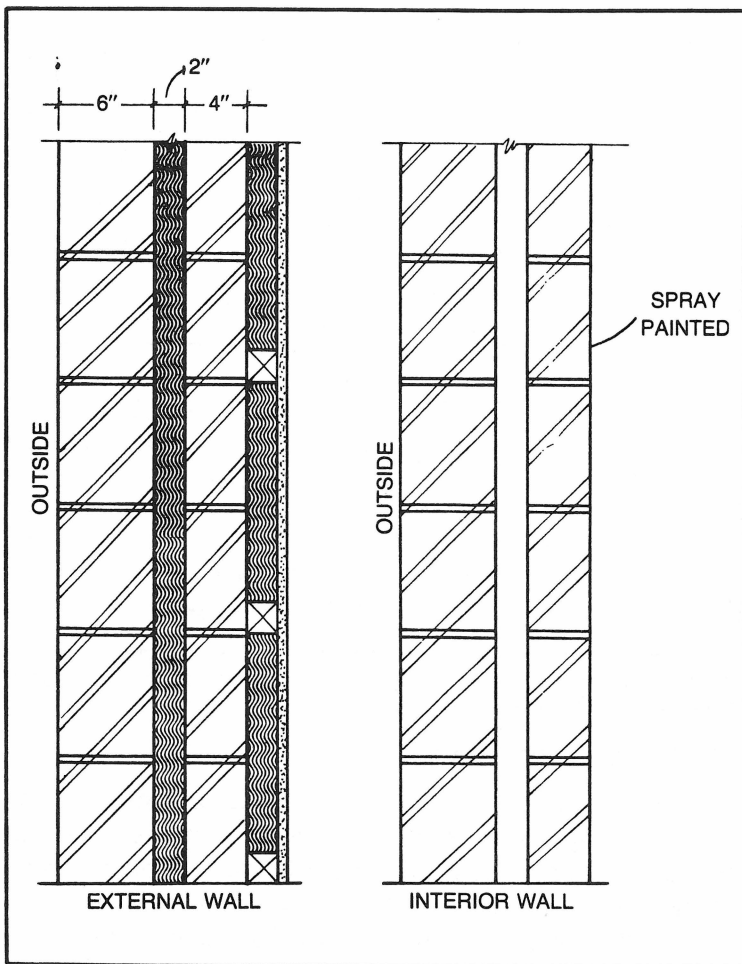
Wall construction details for studio walls. As this studio is located in a northern area, the external walls are filled with glass fiber insulation between the two concrete block tiers and the inner face is covered with $\frac{5}{8}$ inch gypsum board furred out 2 inches with insulation behind. The interior walls are of the same block construction but without the thermal treatment.
